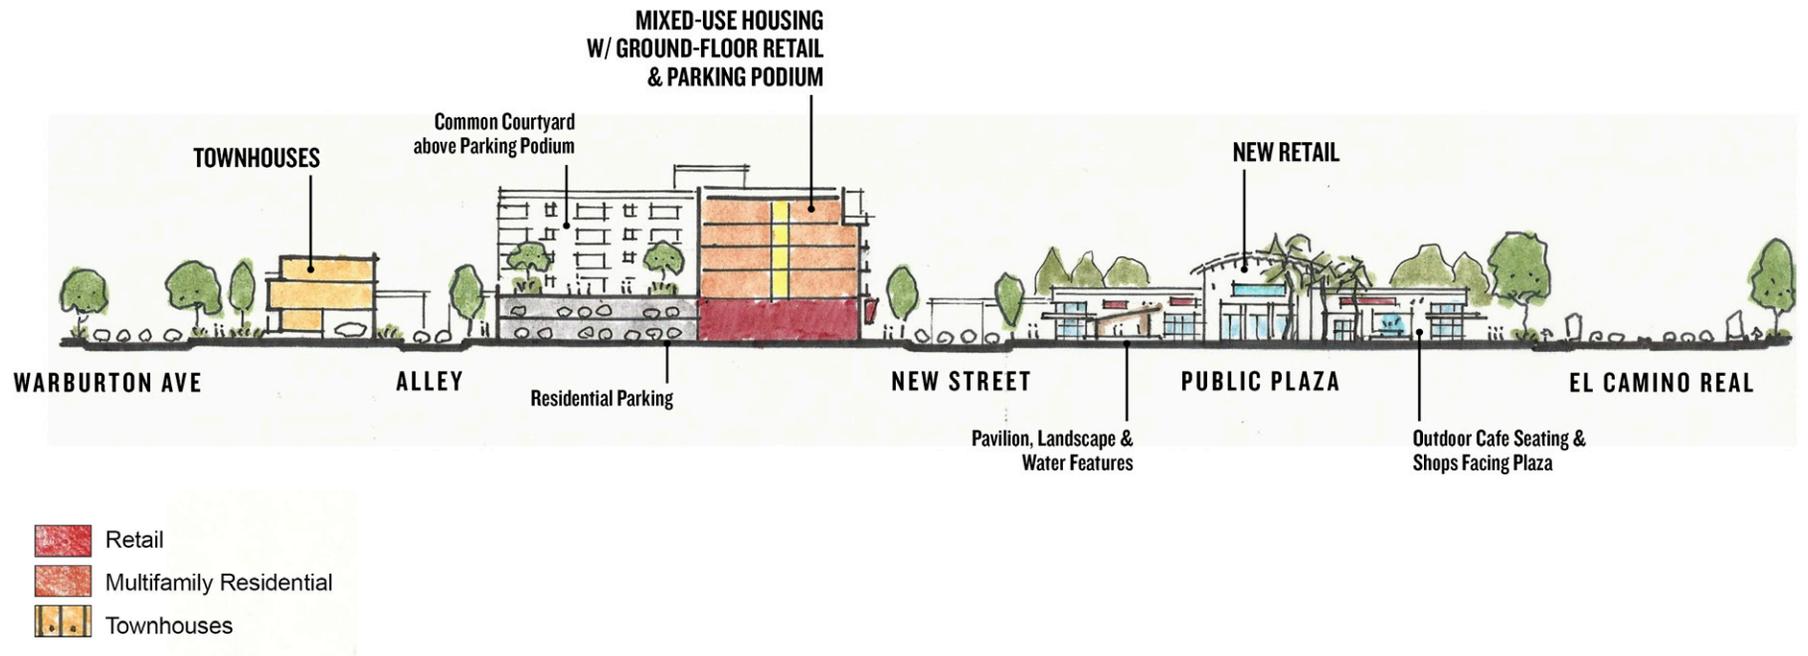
Regional Commercial Mixed Use – Santa Clara Town Center Conceptual Site Plan
